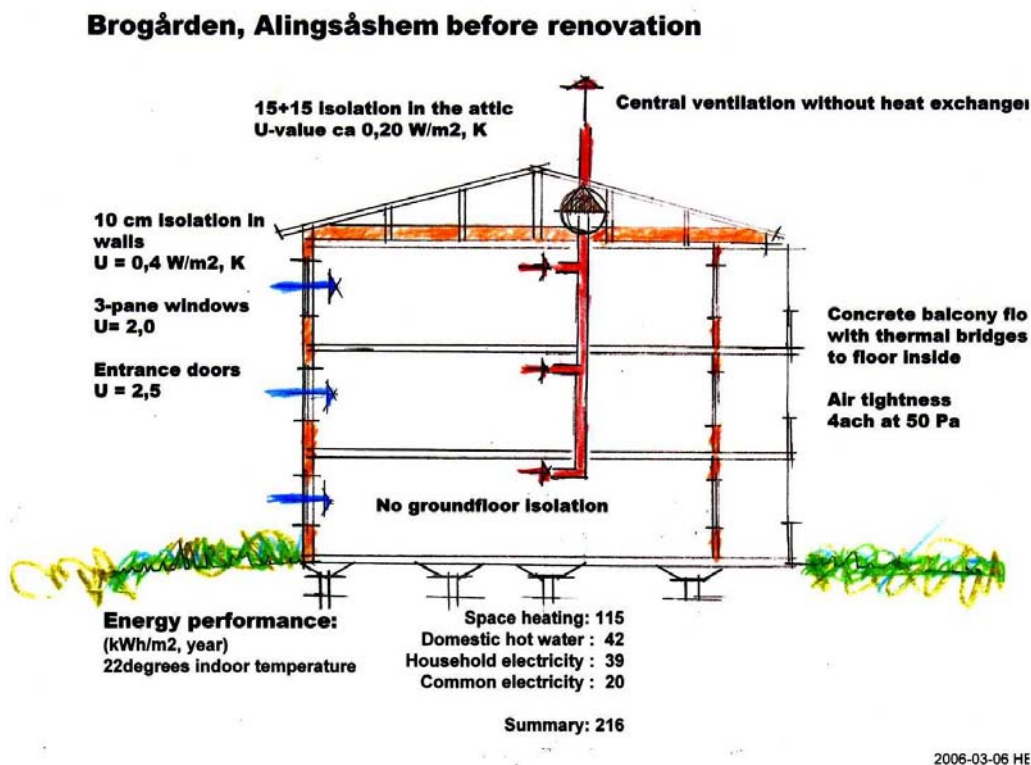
Building envelope and installations pre renovation. Illustration by Hans Eek.
